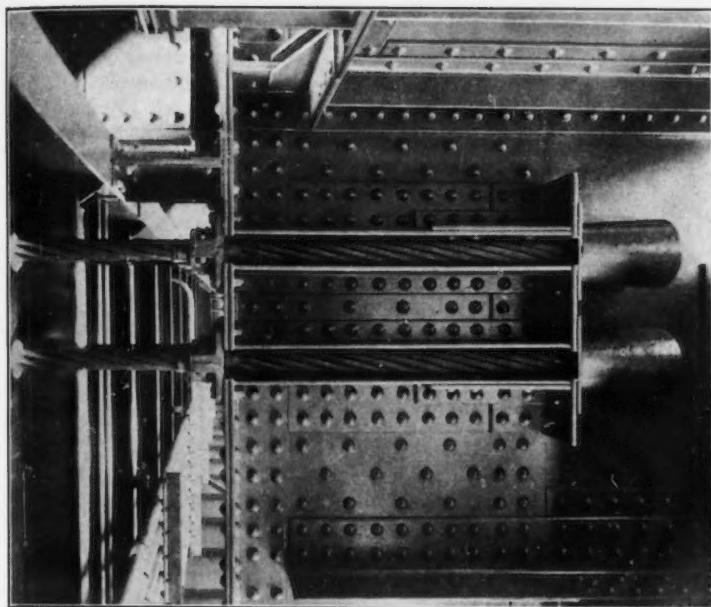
VIEW OF LOWER SUSPENDER CONNECTION.
